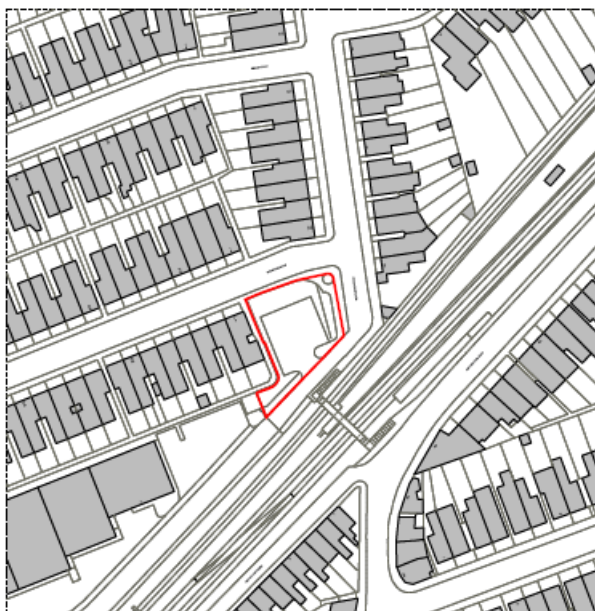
Extract of Site Location Plan (ref. WP-0780-A-0001-P-XX)
